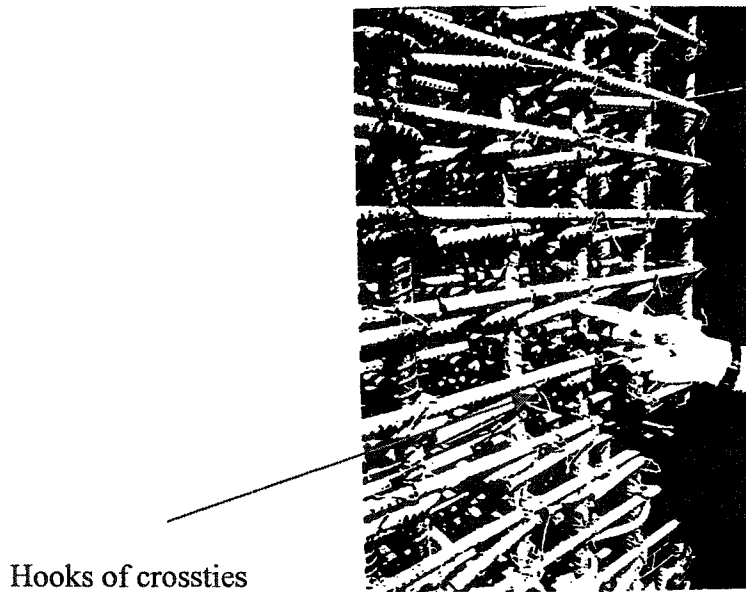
Reinforcement congestion due to hooks of crossties and rings
